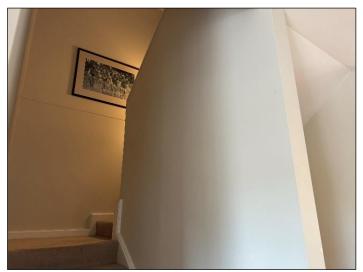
Current stair case configuration where wall is proposed to be changed into a balustrade (Source: Council's Assessment Officer).
